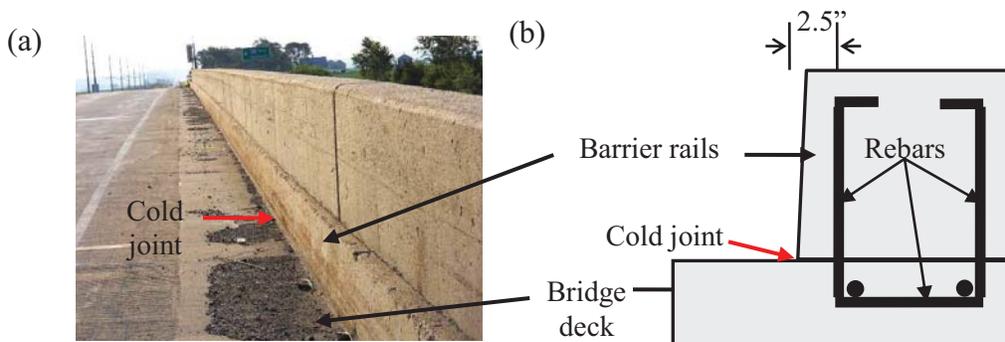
(a) A photograph of a highway overpass showing the cold joint between the road deck and the barrier rail. (b) A schematic showing the locations of rebars that anchor the barrier rail to the bridge deck.
